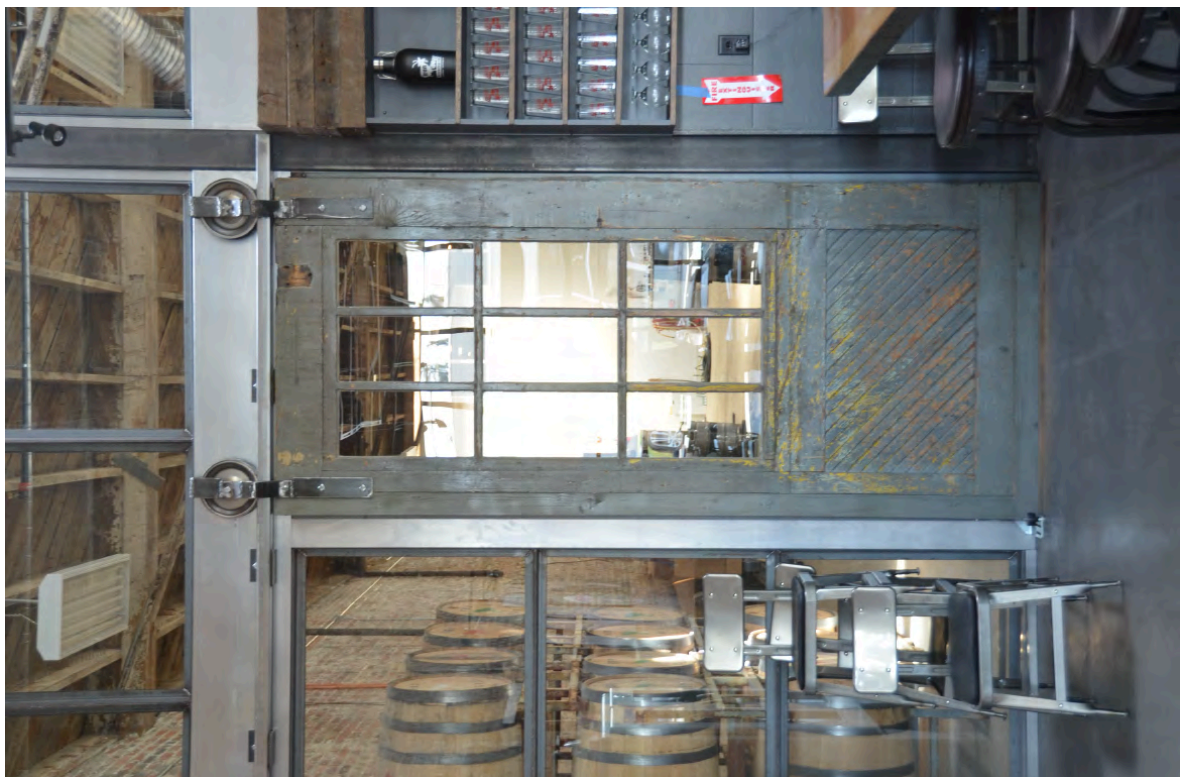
Looking @ Repurposed Door between Tap Room and Brewery (West)
